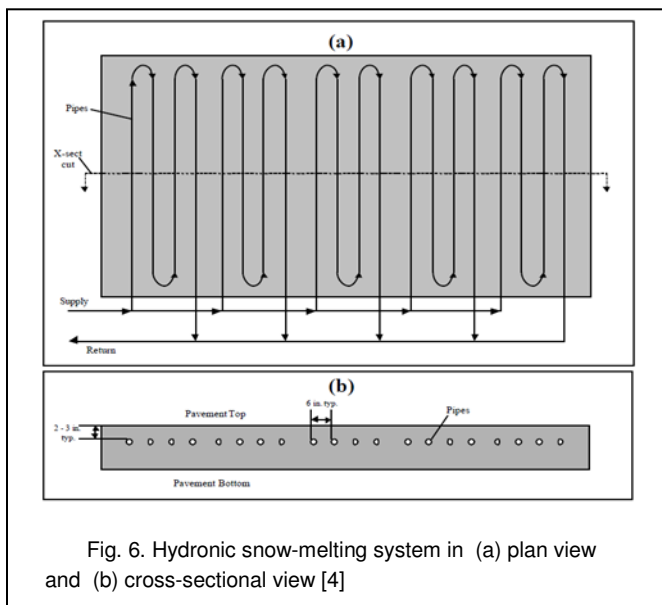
Hydronic snow-melting system in (a) plan view and (b) cross-sectional view [4]
